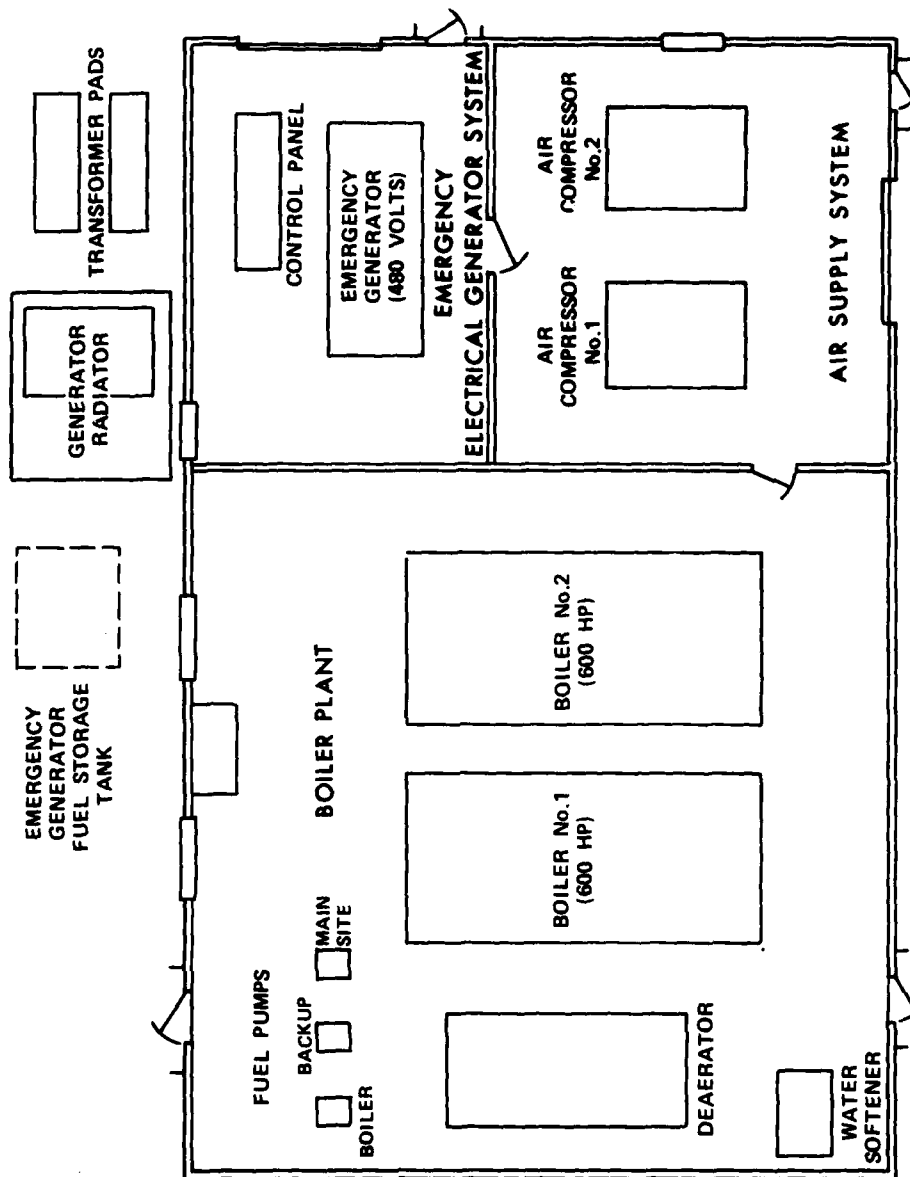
UTILITIES HOUSING LAYOUT
